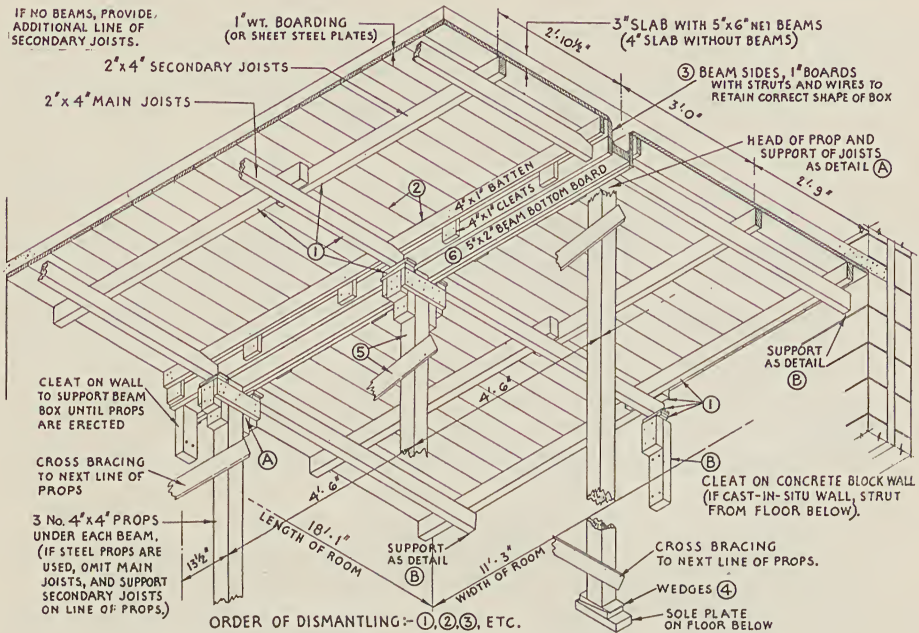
SHUTTERING FOR UPPER FLOOR OR FLAT ROOF.
